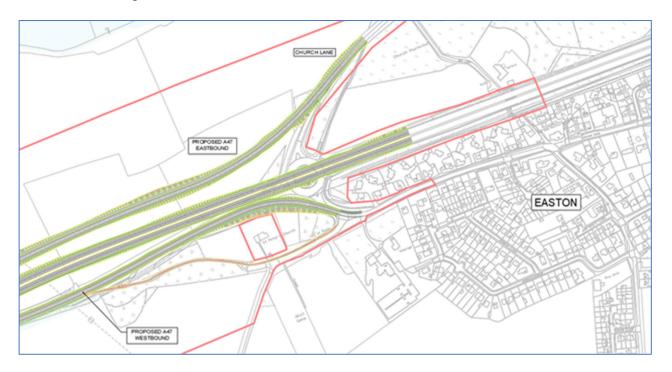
Existing roundabout at intersection of Church Lane and Dereham Road
